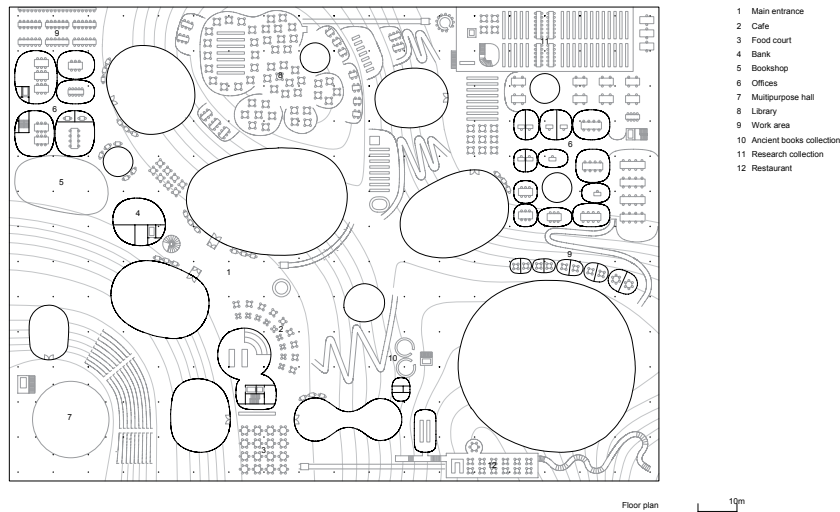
Learning Centre Floorplan 1:1'000 (SANAA 2010)
